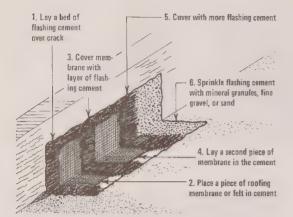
Repairing a Crack in Asphalt Flashing The Old House Journal, April 1983, p. 65.
